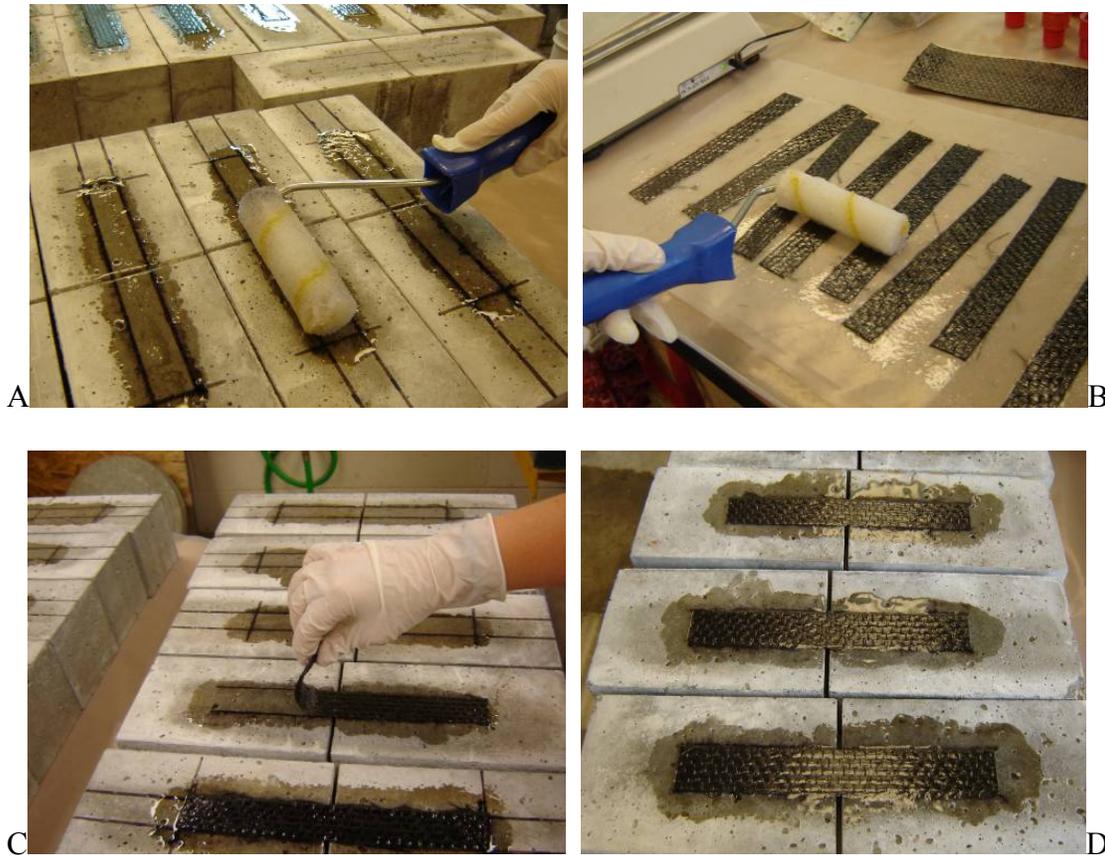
14. Application of Composites D and E. A) application of prime coat to concrete surface using nap roller B) saturation of fiber fabric C) placing of saturated fabric on concrete surface D) completed construction of composites D and E
